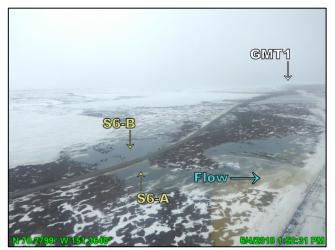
Drainage equalized on both sides of the GMT1 access road near S6 monitoring location, looking southwest; June 4, 2018
